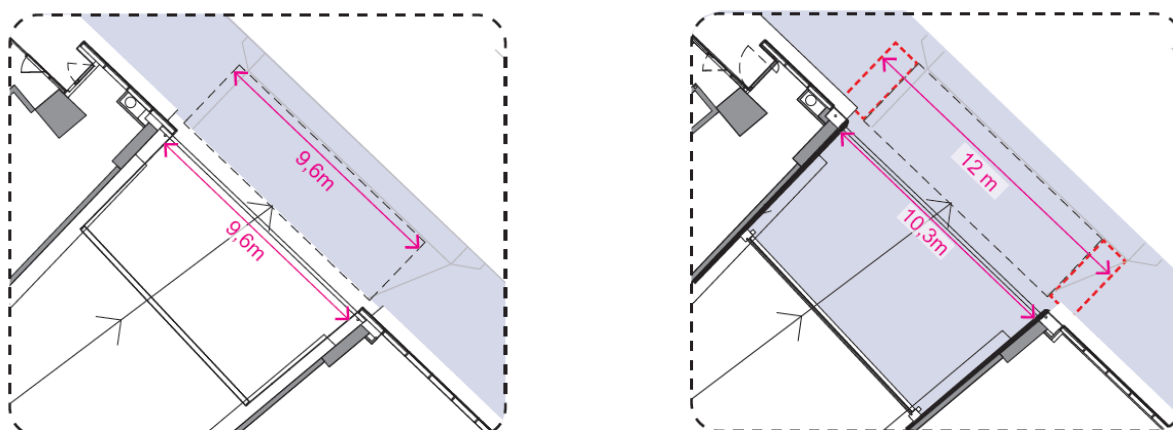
Approved driveway entrance (left) and proposed, widened entrance (right)
